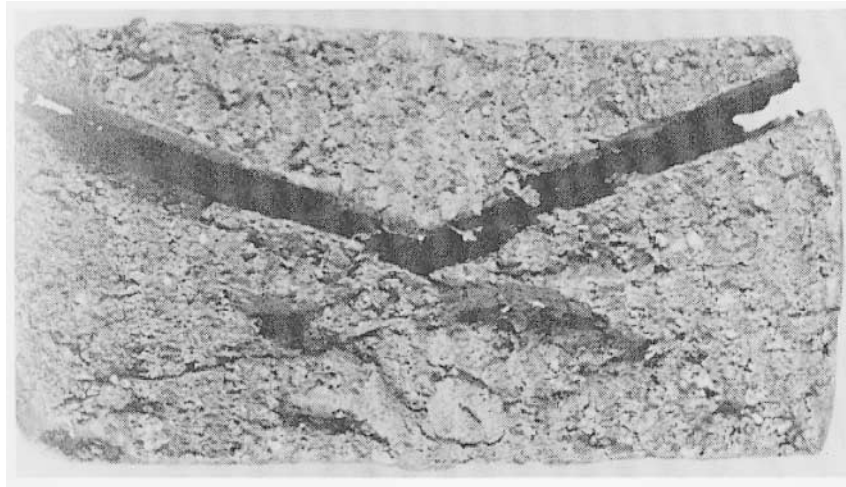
Passive failure of compacted clay till due to one-dimensional swelling.
